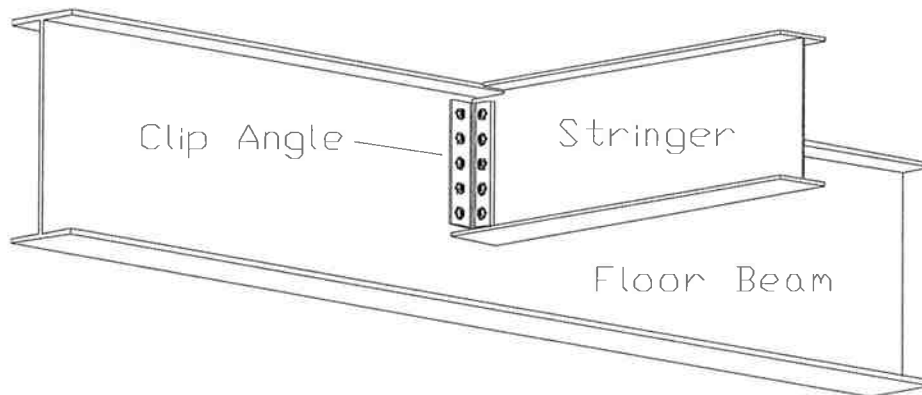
Typical stringer to floor beam connection detail assembly.
